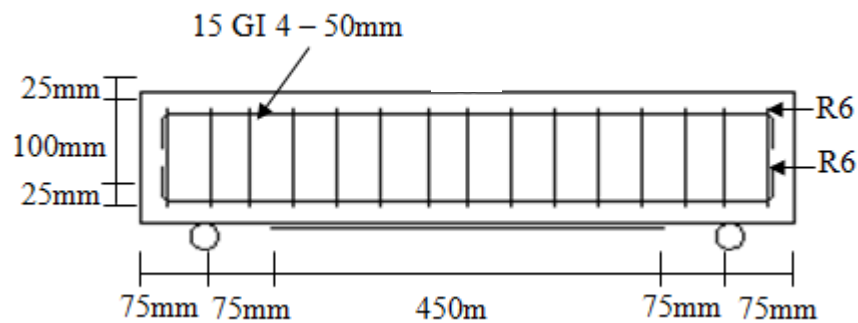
Schematic diagram of Geometry and reinforcement arrangement of test beams
